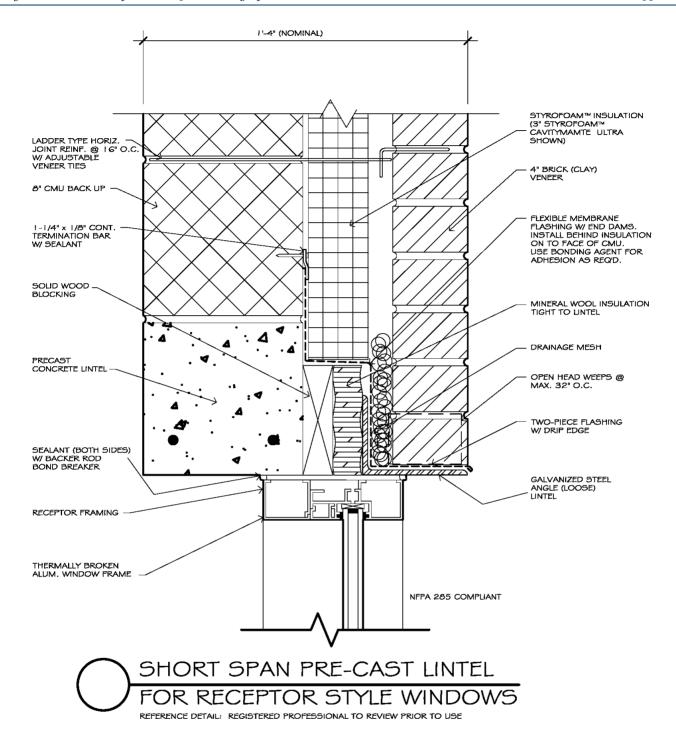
Window / Door Opening Detail w/Mineral Wool & Fire Treated Wood Blocking
